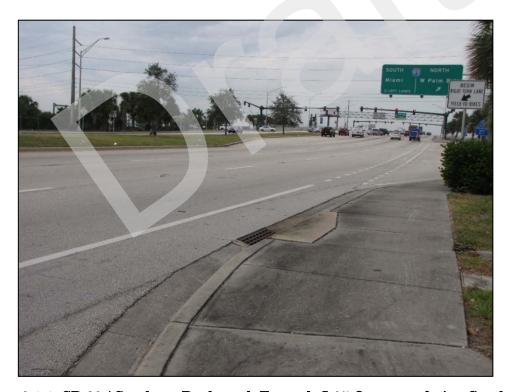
SR 80 / Southern Boulevard, Towards I-95 On-ramp, facing Southwest
